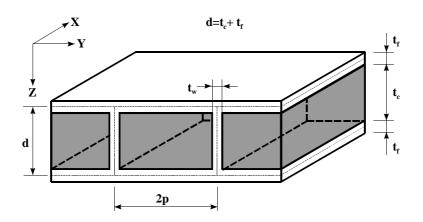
general geometry of the sandwich test specimens.
